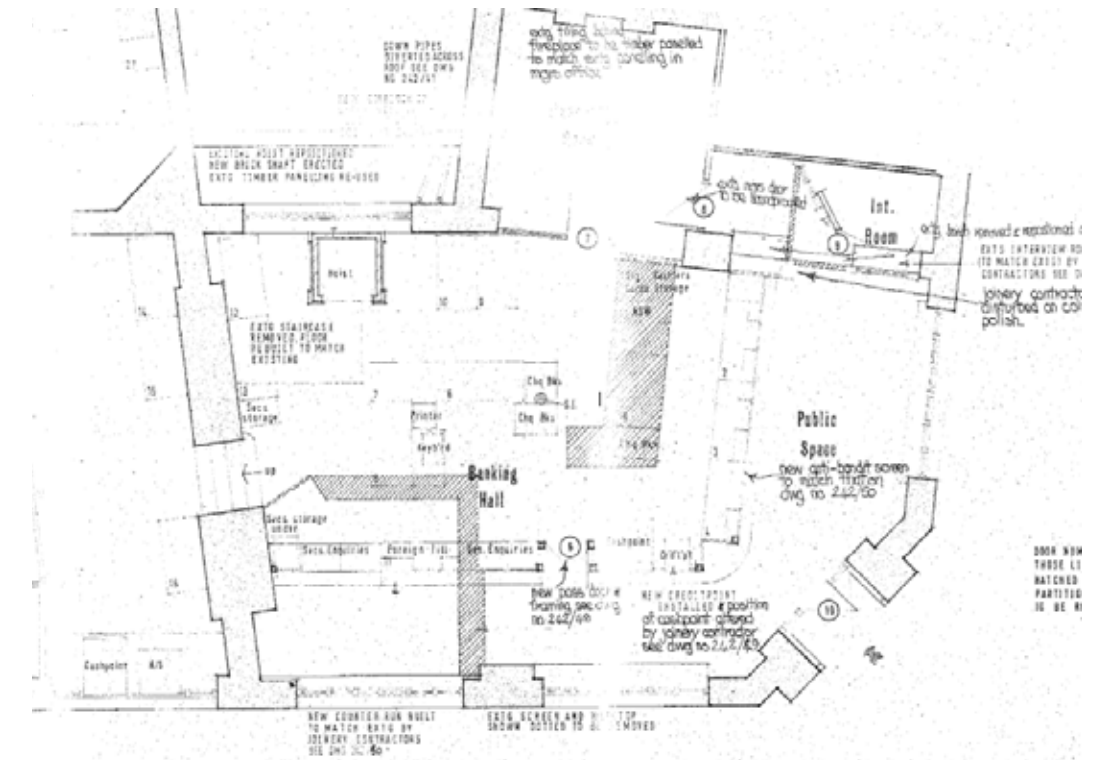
1980 Proposed ground floor plan, Planning Ref. HB2583
